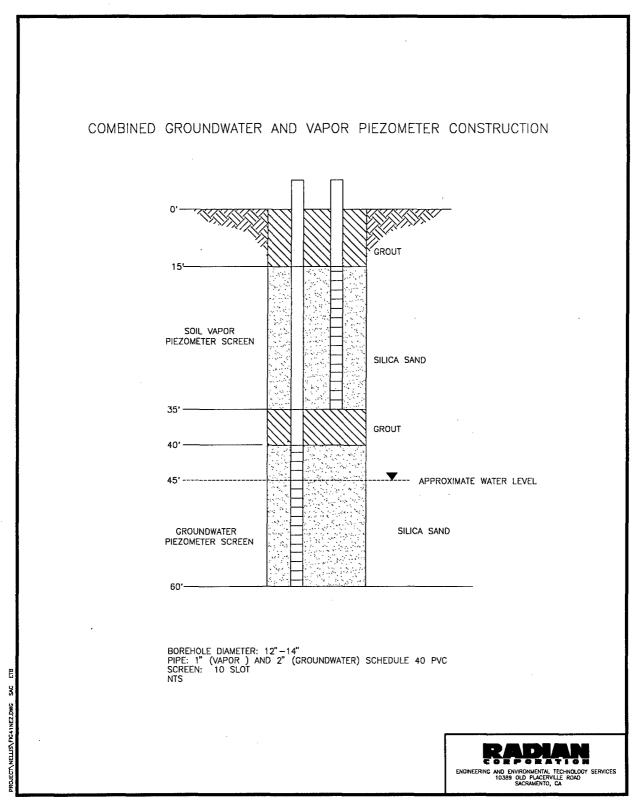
Piezometer and Vapor Probe Construction Cross-Section
